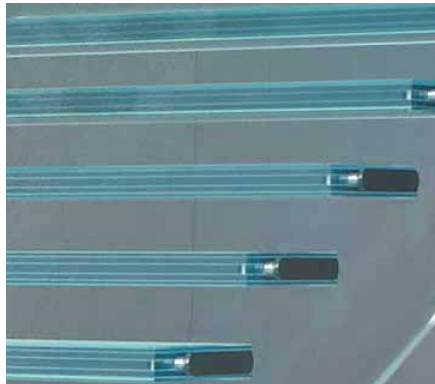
Laminated longitudinal stair fitting, Apple Westlake 2016, (EOC)
